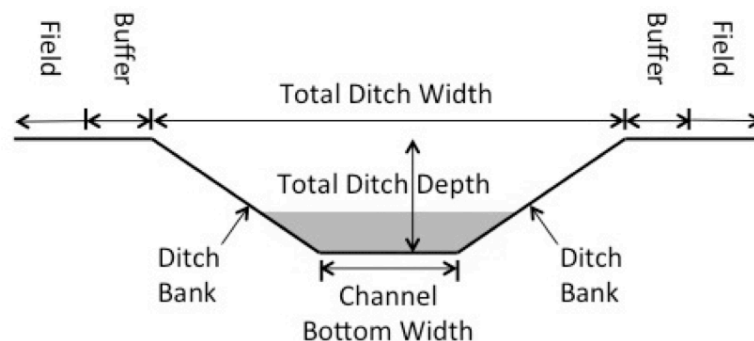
A typical conventional (trapezoidal) drainage ditch cross-section (Kramer, 2011).
